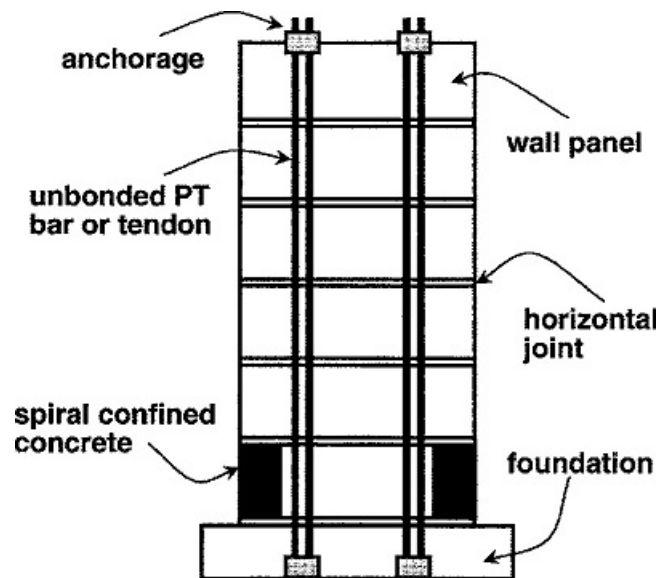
Schematic of an unbonded post-tensioned precast wall (from Kurama et al. 1999)
